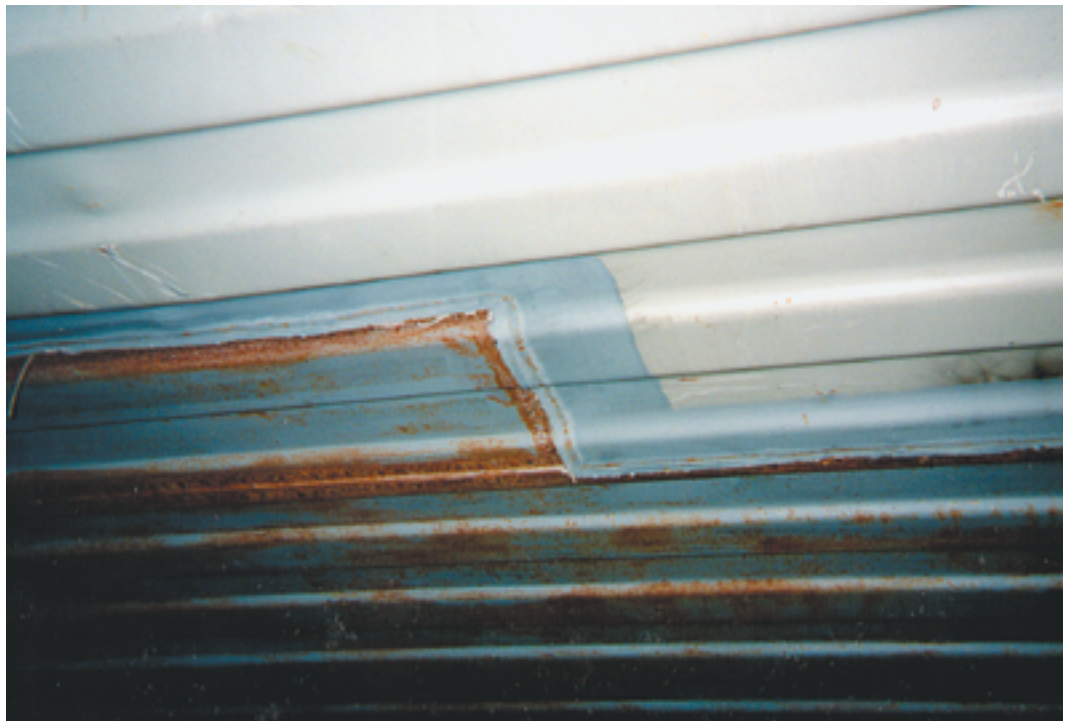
/ Corrosion due to improper surface preparation of roof panel patch
